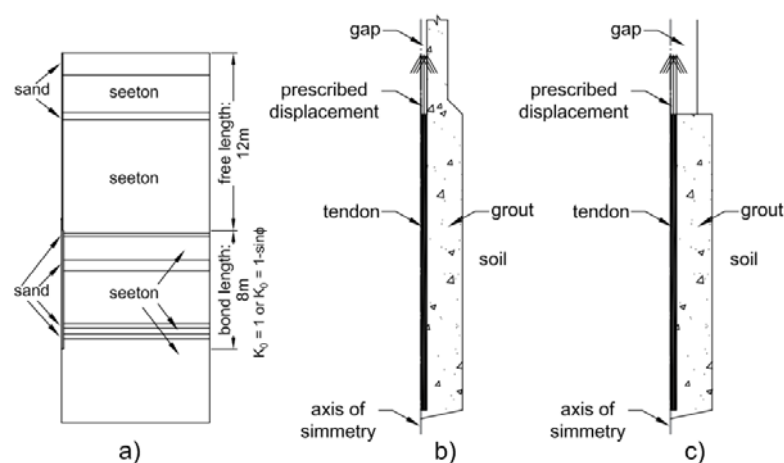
Model geometry: a) Full geometry; b) anchor detail (S1 and S3) and c) anchor detail (S2)
